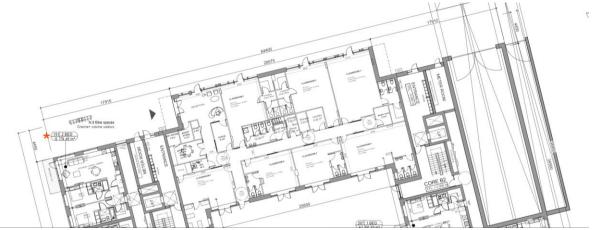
Extract of Creche floor plan (Source MCORM Drawing No PL 37_ Block B Ground Floor Plan)
